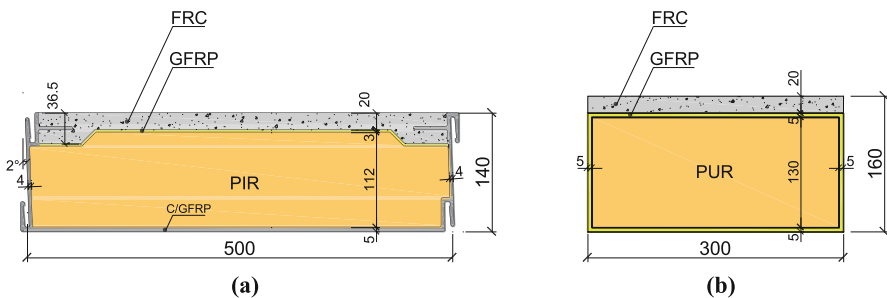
Final geometry of the hybrid sandwich panel: (a) final design and (b) test specimen. Units in [mm].
